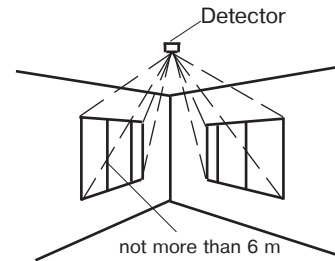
Installing the Detector on the Ceiling (for window openings in the neighboring walls monitoring)
